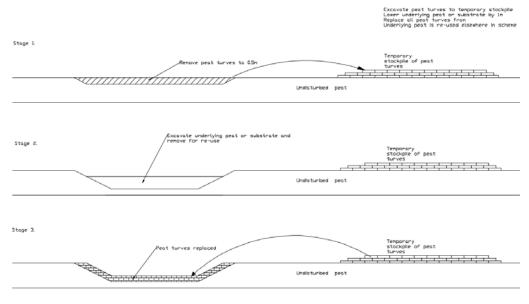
Calculation of Excavation and Re-instatement Volumes (Compensatory Flood Storage)
